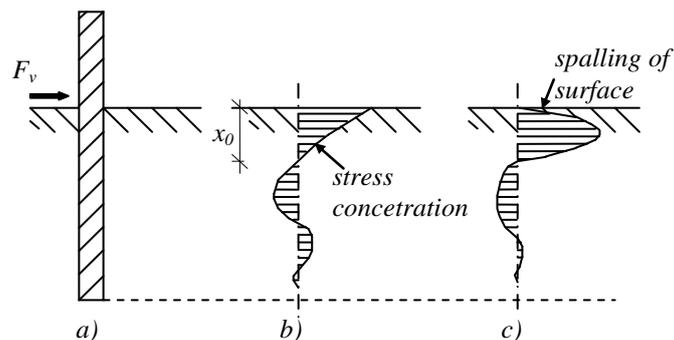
Dowel action, a) a one-sided dowel pin is loaded by a shear force and is used for resisting the load at the joint interface, b) bearing stresses in the surrounding concrete in the plane through the dowel pin, c) due to spalling of the concrete at the surface the bearing stresses become zero there. The figure is based on fib (2008).
